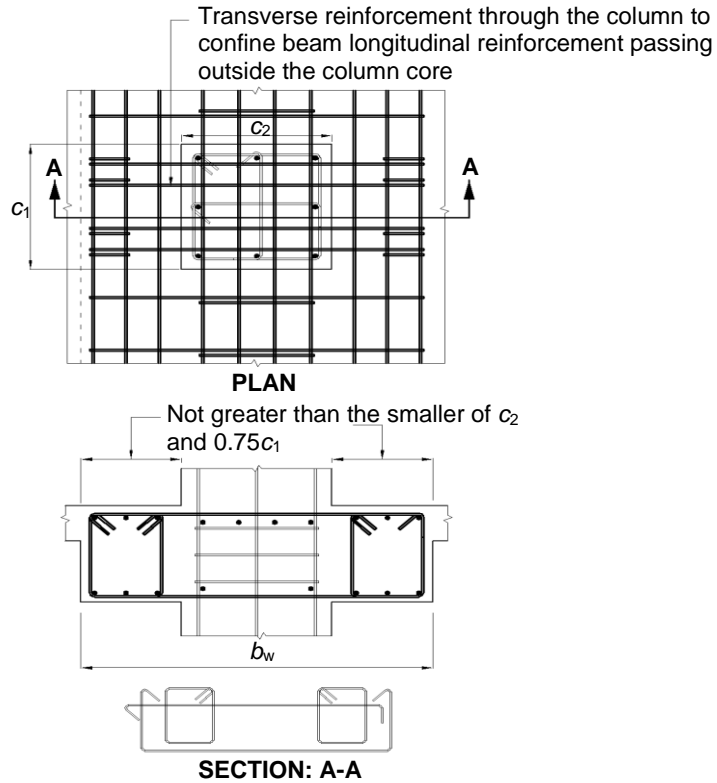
(B) MAXIMUM EFFECTIVE WIDTH OF WIDE BEAM AND REQUIRED TRANSVERSE REINFORCEMENT
